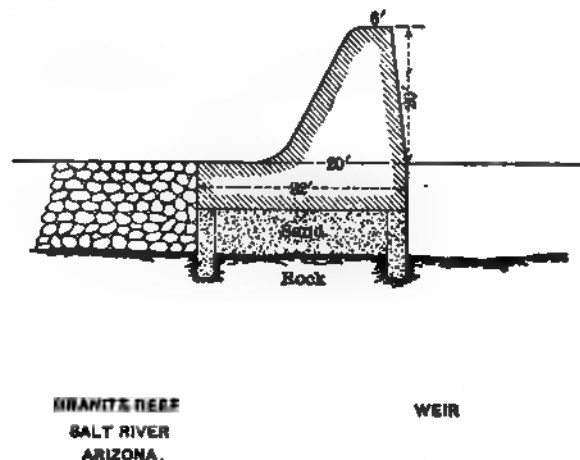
GRANITE REEF WEIR ON ROCK FOUNDATION.
